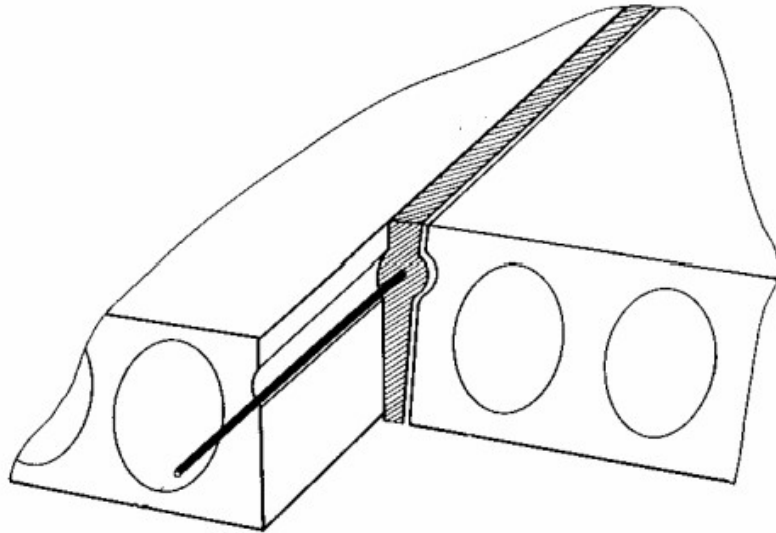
Lateral void filled with grout with longitudinal steel rebar (Engström et al., 2008).
